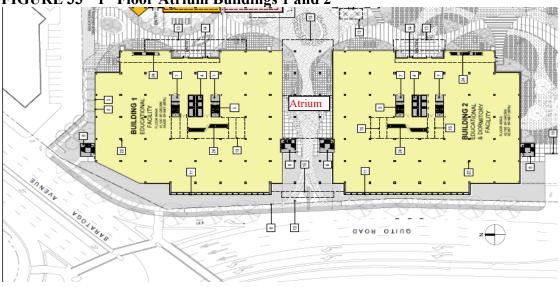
1<sup>st</sup> Floor Atrium Buildings 1 and 2
